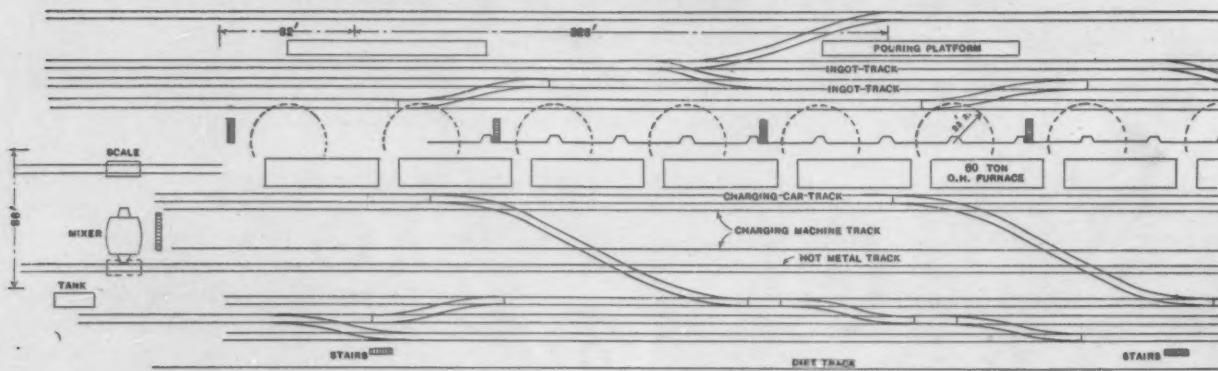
A Portion of the Plan of One of the Open Hearth Buildings, Which Is Typical of the General Arrangement.
